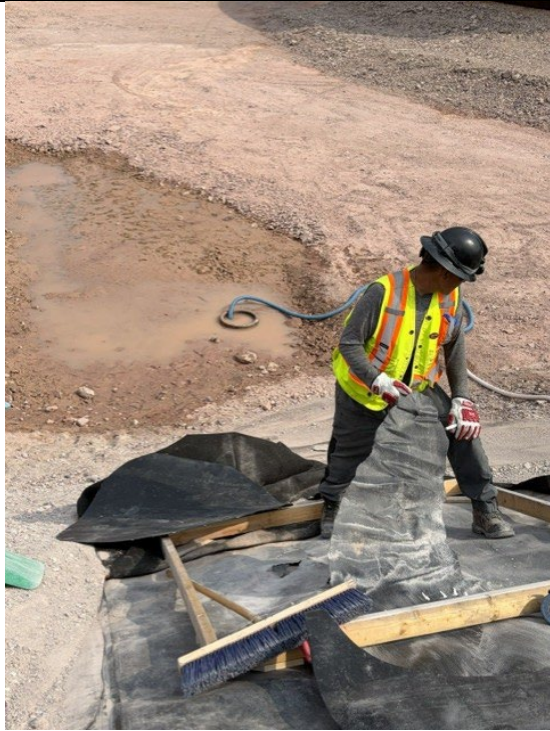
Damaged Liner NW Corner of Tank Farm 1
